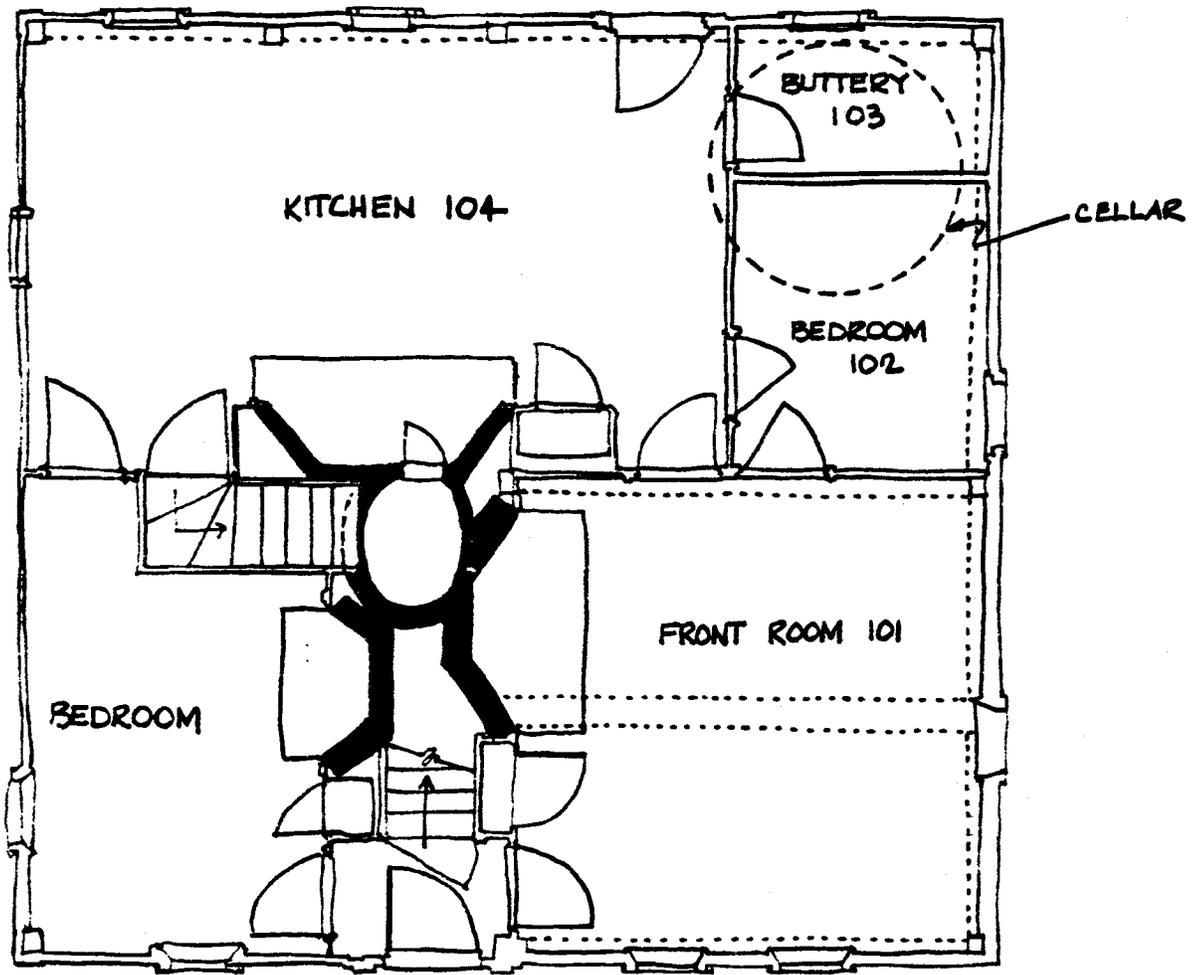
Atwood-Higgins House: Conjectural First-Floor Plan, 1775-1790.
